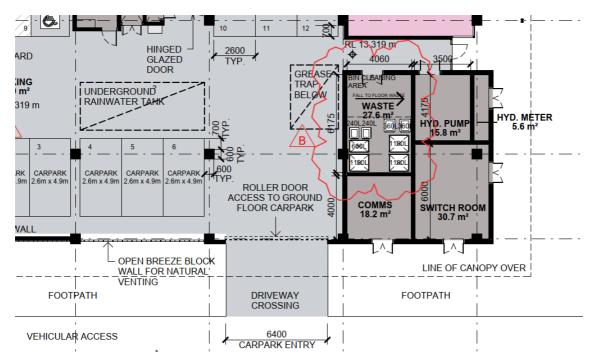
Waste facilities Building Office B, Source: TP200 Building B Proposed Ground +L1 by Six Degrees Pty Ltd
